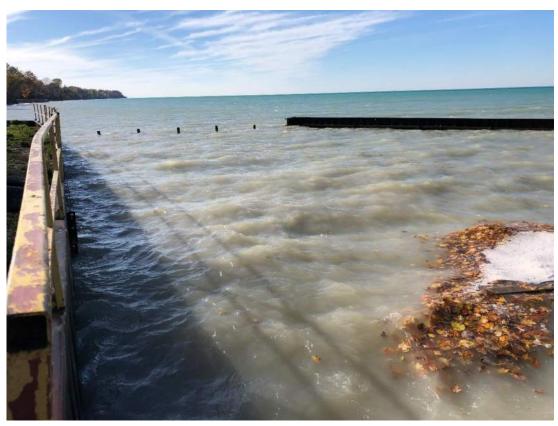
Missing Groyne Wall, Looking from Boat Ramp
